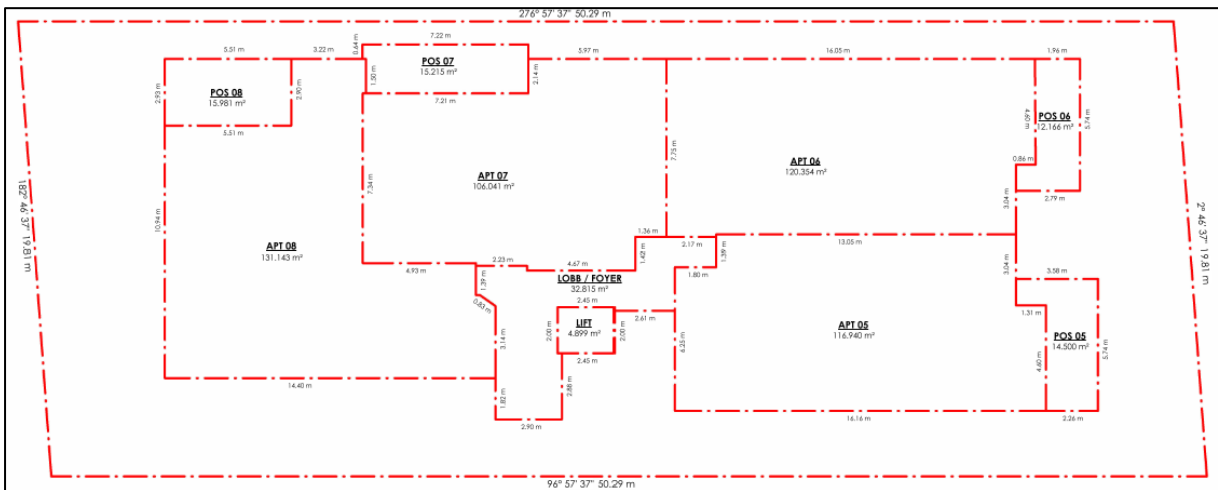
(Above) Proposed mid (first) floor plan of subdivision. Source: Application documents.
